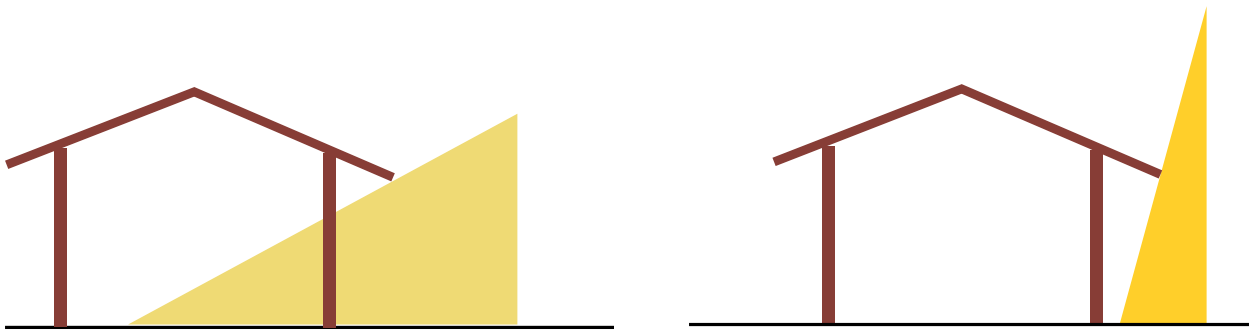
Shed orientation and roof overhang should allow entry of morning sun to dry the floor.
